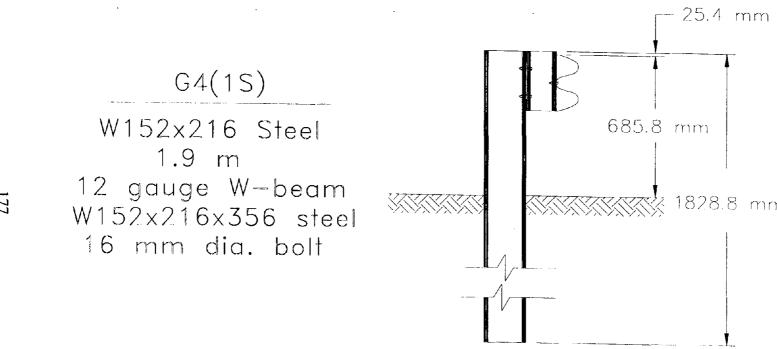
Cross-section of the W-beam, steel-post (G4(1S)) guardrail system.
